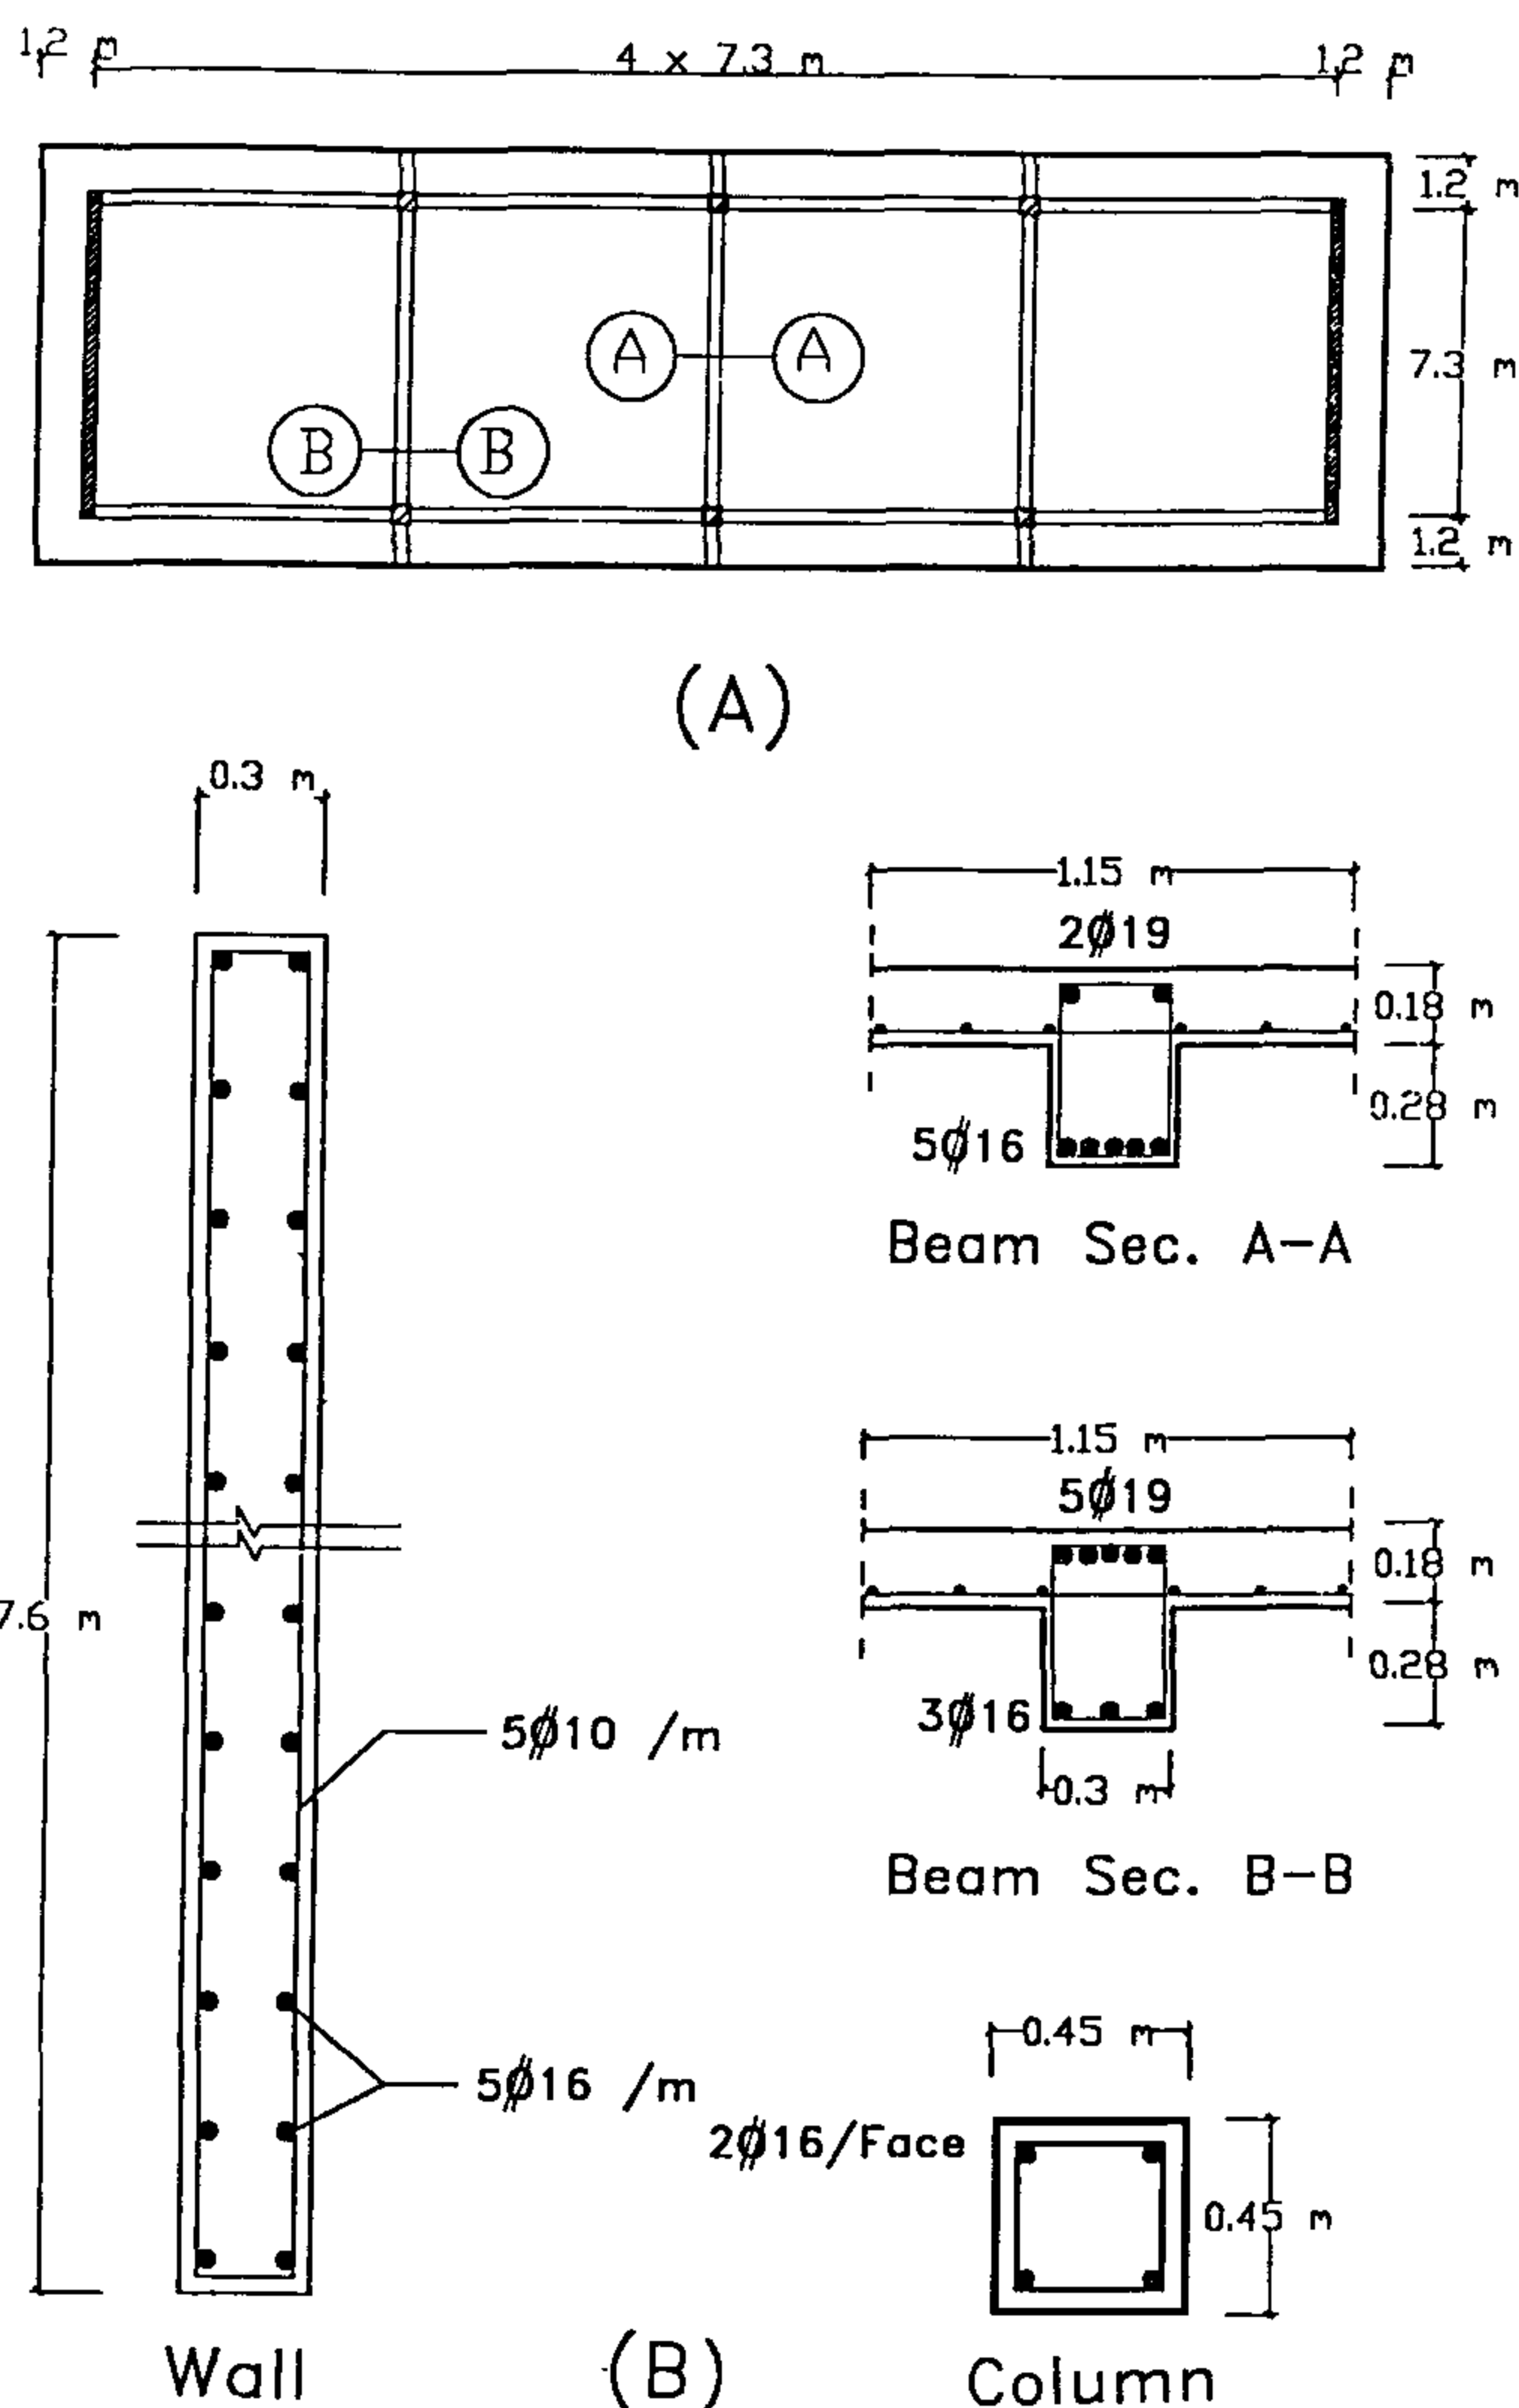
Configuration of the studied structure: a) Floor plan; b) Details of different elements cross section
